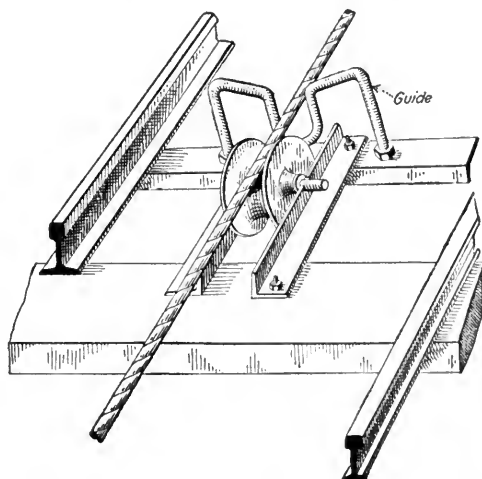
BRACKET FOR GUIDING HOISTING ROPE TO SHEAVE.
